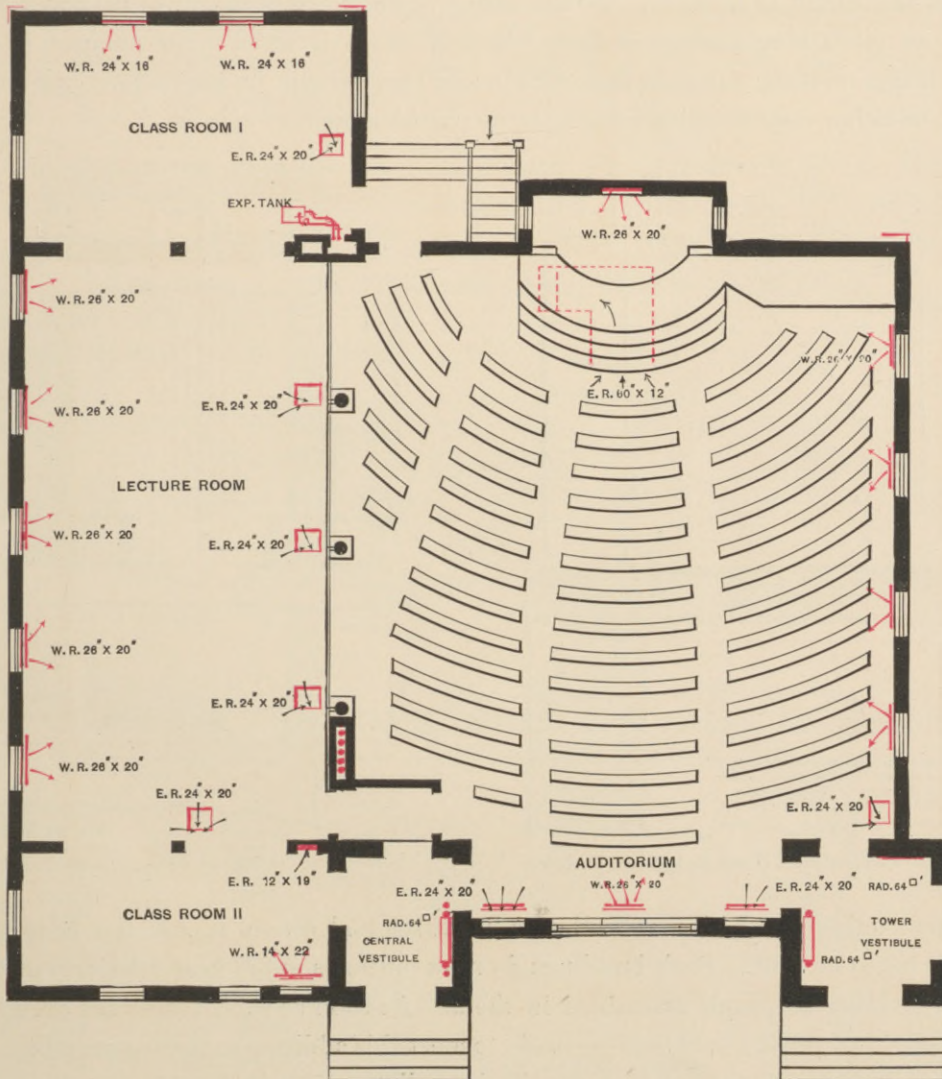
Plan of Main Floor. Scale  $\frac{1}{16}$  inch to the foot.
